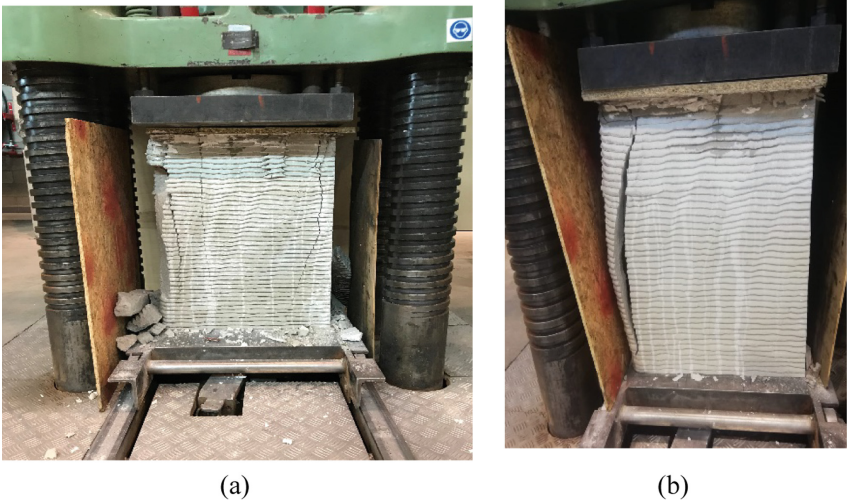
Failure mechanism in case of (a) structural wall and (b) insulated wall type
